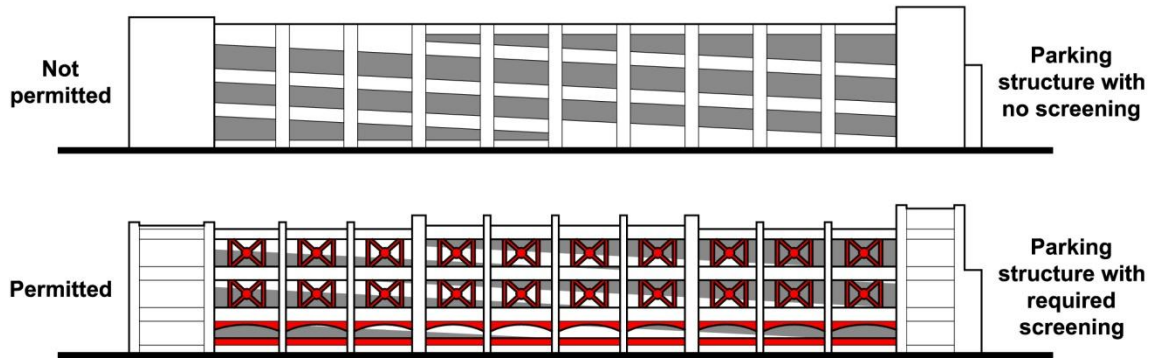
NON-CONFORMING FAÇADE DESIGN (LEFT) AND CONFORMING FACADE DESIGN (RIGHT)
